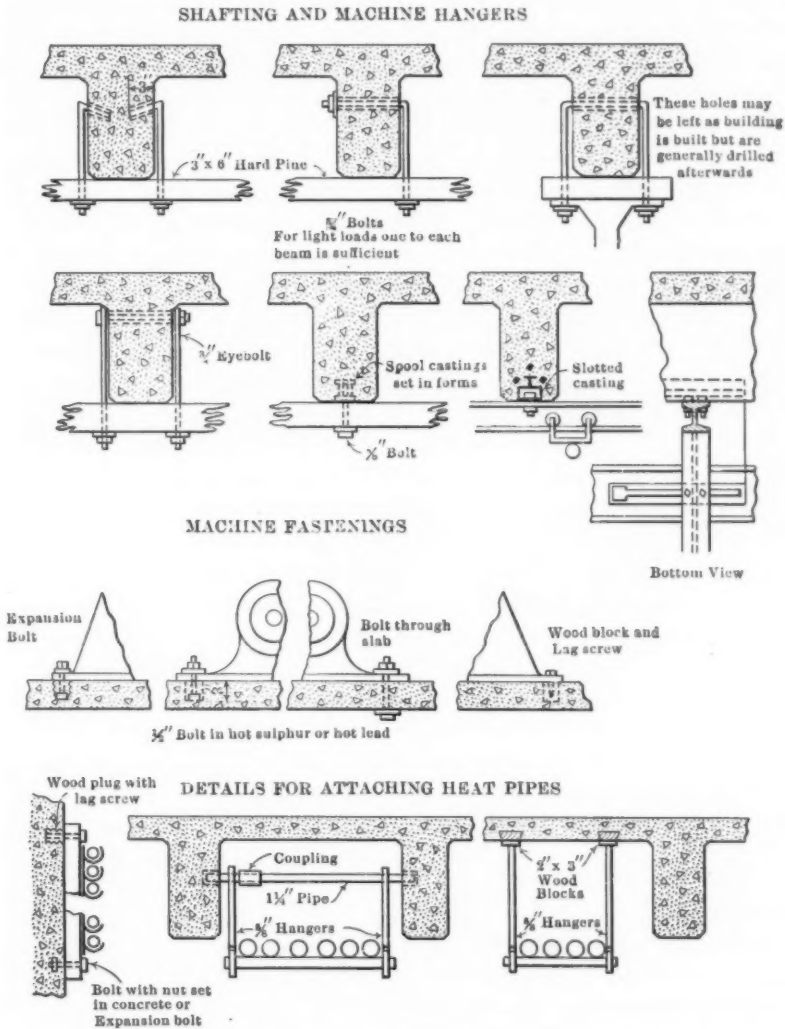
DETAILS OF HANGERS AND FASTENINGS IN CONCRETE BUILDINGS
